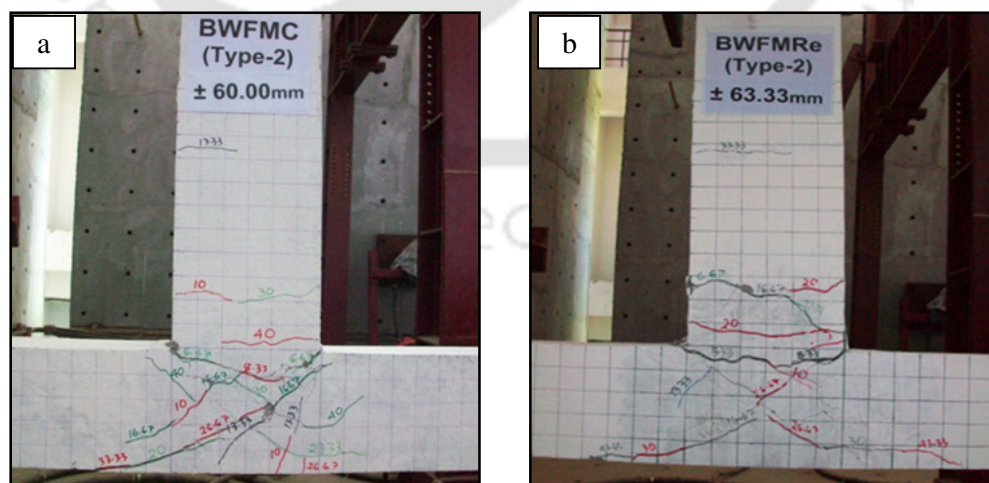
BWFM specimens at the end of test under loading type-2:
